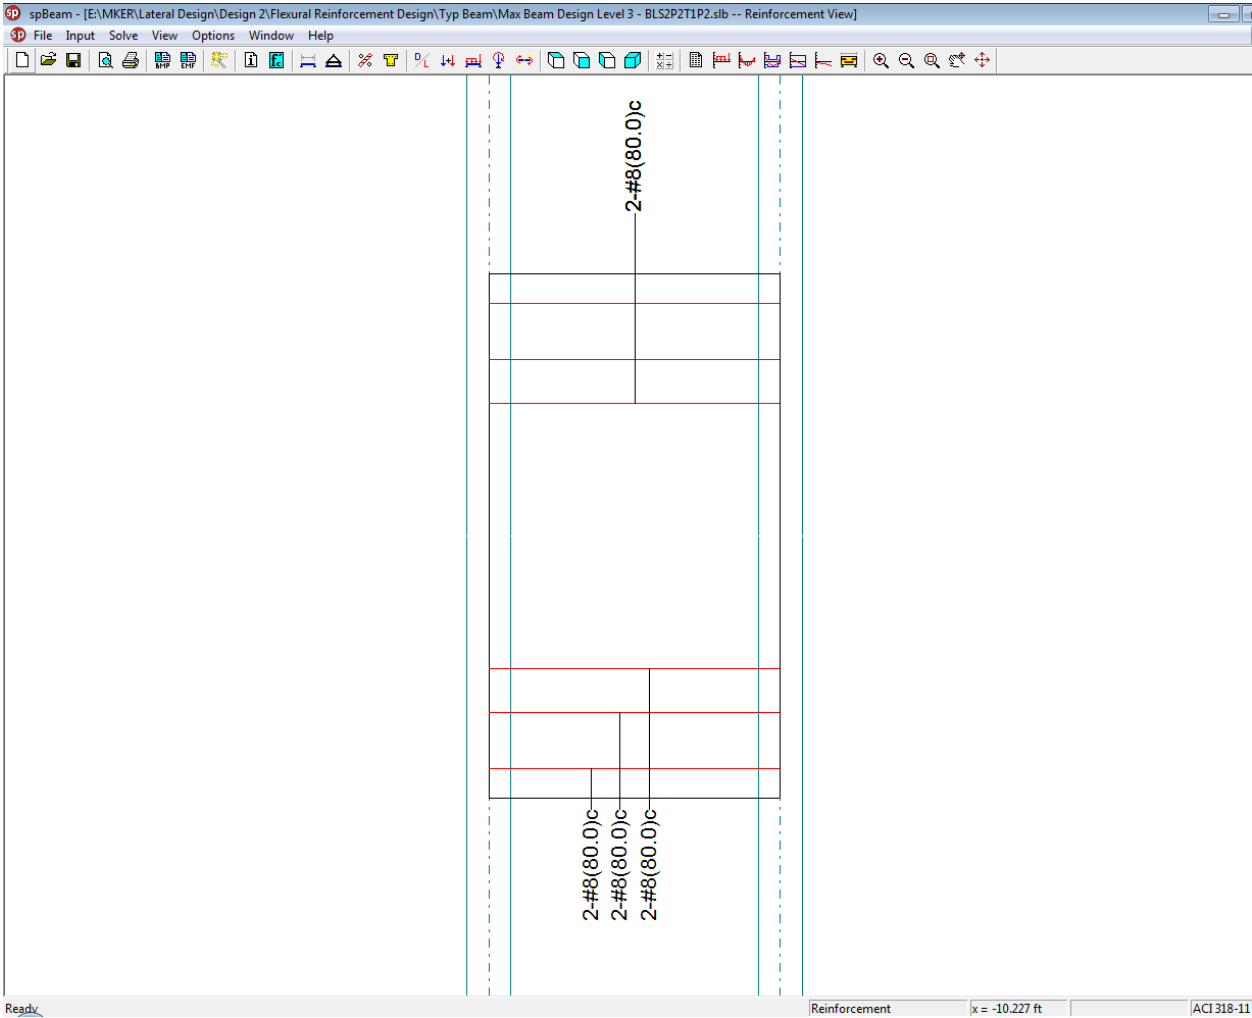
, spBeam Flexural Reinforcement Design of BLS2P2T1P2 Lvl. 3
